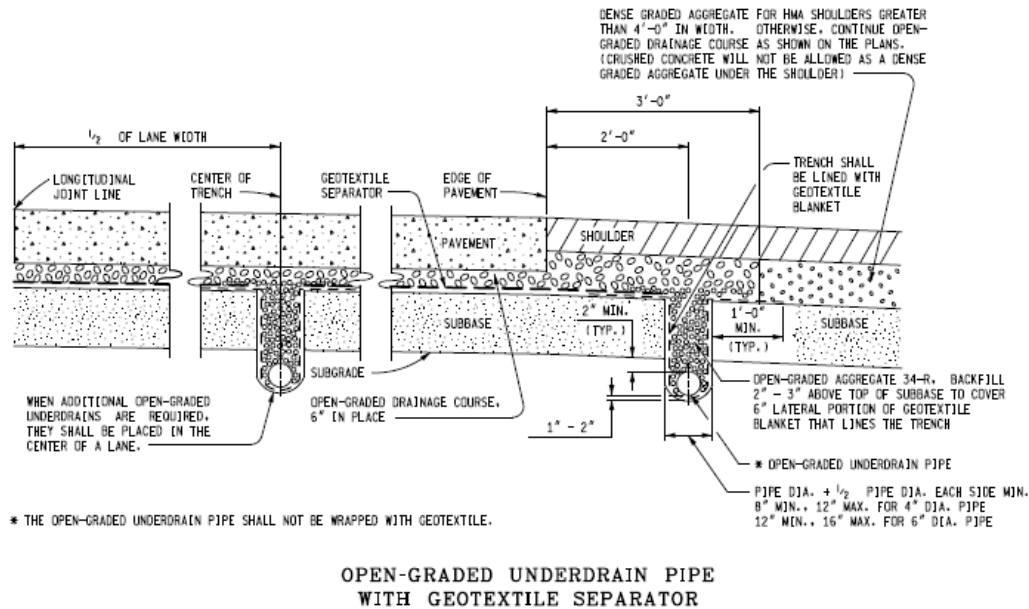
Typical subsurface drain system (Michigan DOT 2019).
